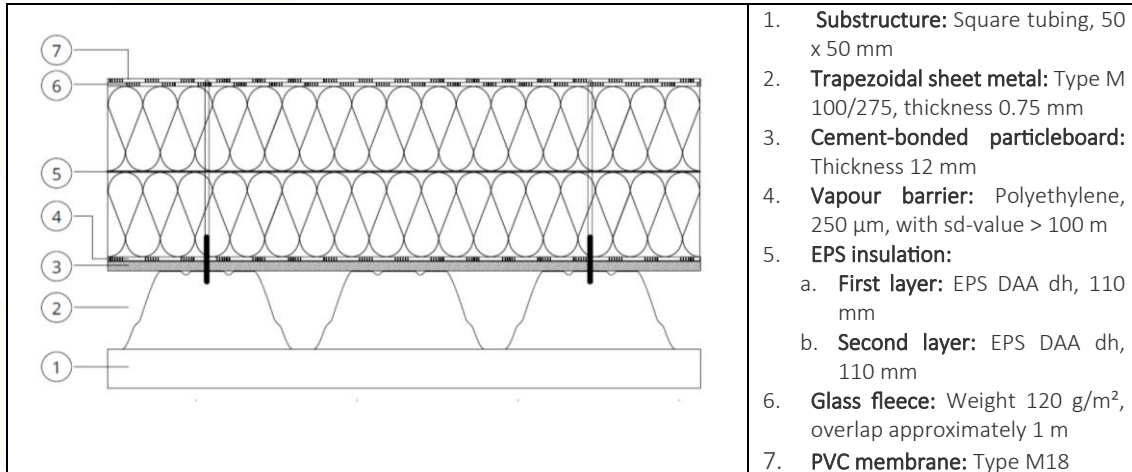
Cross-section of the roof structure: Tested industrial lightweight roof construction with EPS foam and maximally overlapping glass fleece installation (Layer 6) beneath the PVC roof membrane.
